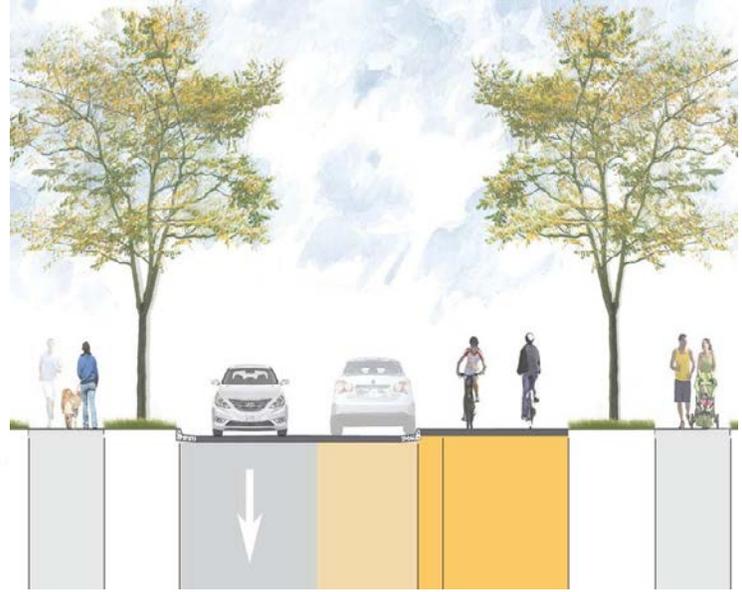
ONE-WAY STREET LIMITS PARKING TO ONE SIDE OF THE STREET, WITH A PROTECTED BIKE TRAIL ADDED NEXT TO THE PARKING
